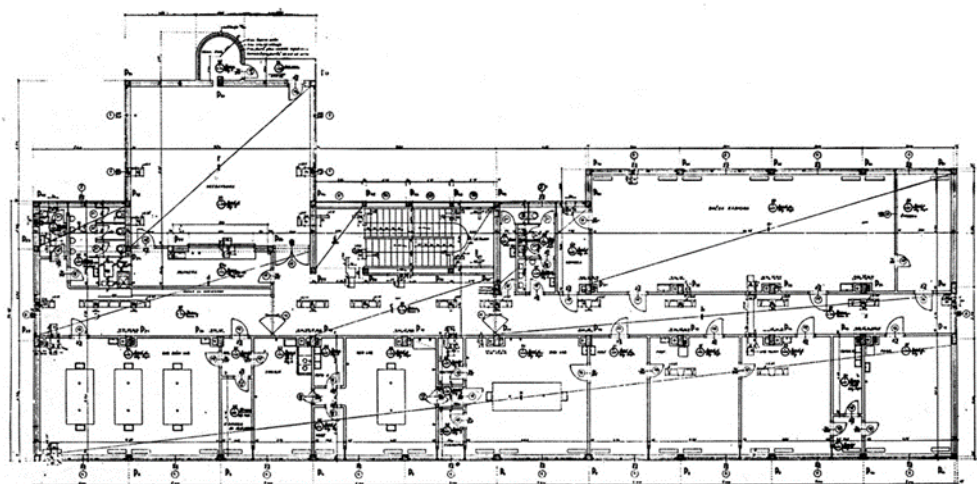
Ground plan of the pavilion according to the design of the Zagreb Working Group
